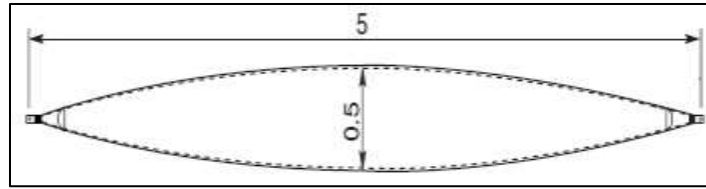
Longitudinal dimensions of spindle shaped Tensairity beam
